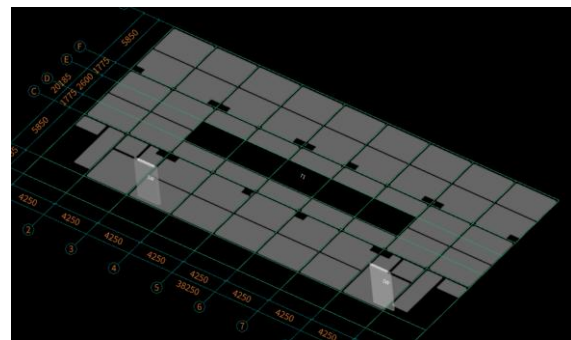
Slab Volume Deduction by Beam, Column, and Shear Wall in Cubicost
